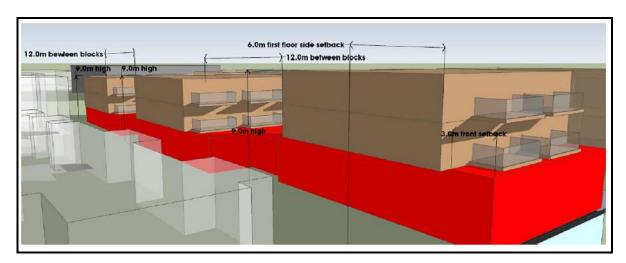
Plan of subject land with indicative setbacks *Note: the written control takes precedence over the above Figure.
